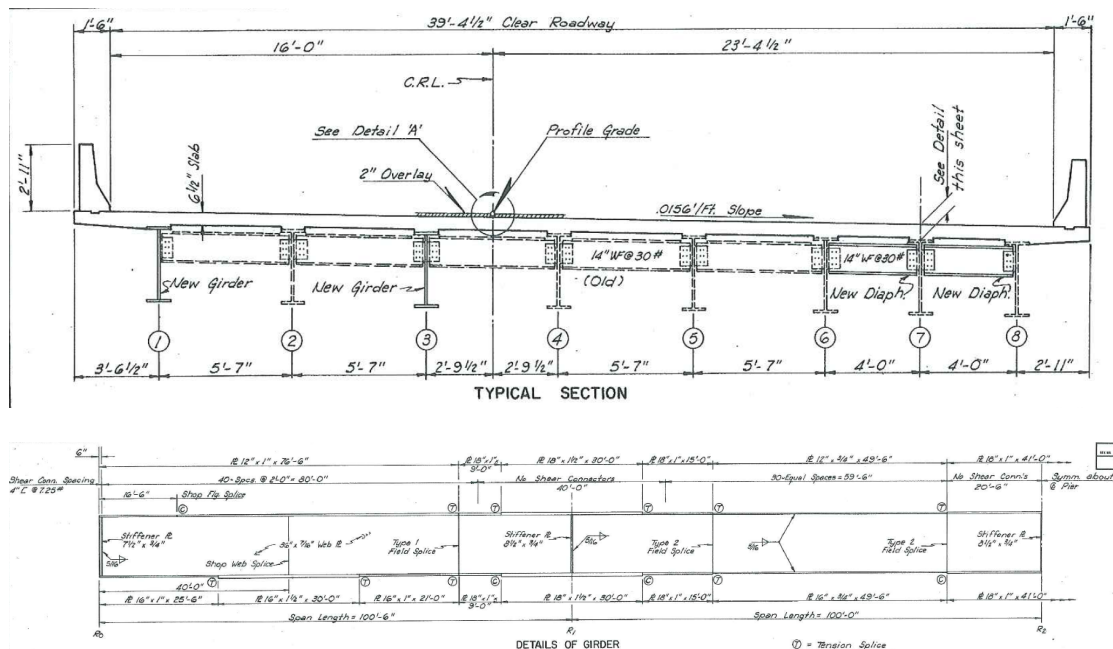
Superstructure details (top) and girder details (bottom). Taken from Proj. No. I-FI-35-4(97)166 plans.
